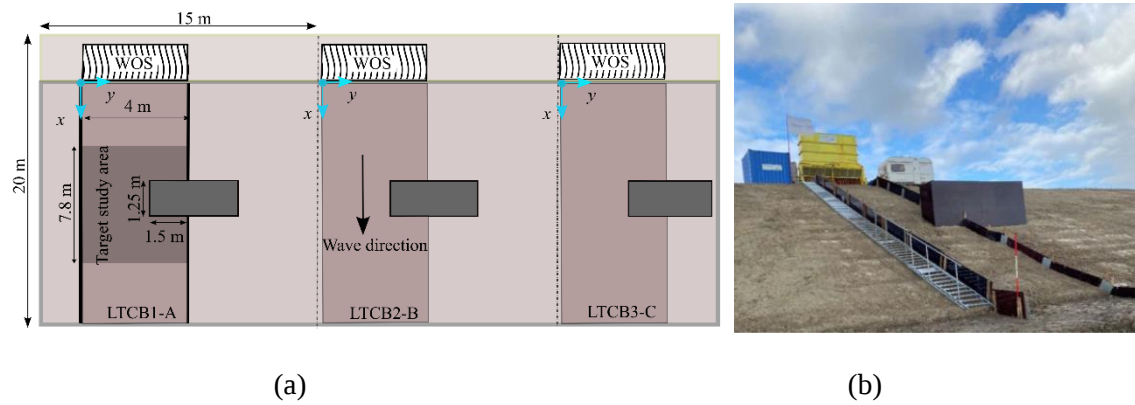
(a) LTCB test location including layout of all sections and target study area; and (b) constructed section.
